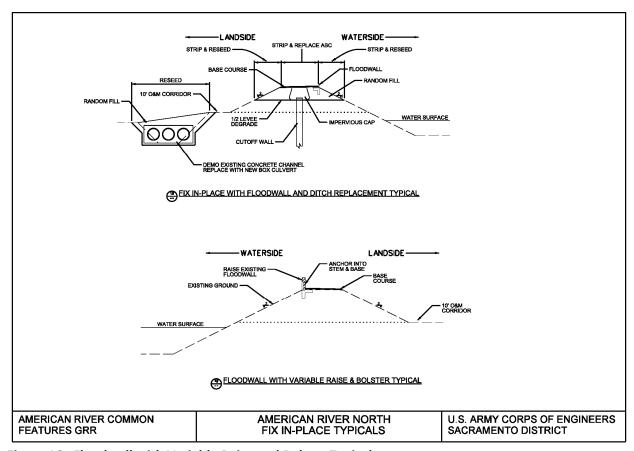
Floodwall with Variable Raise and Bolster Typical.
